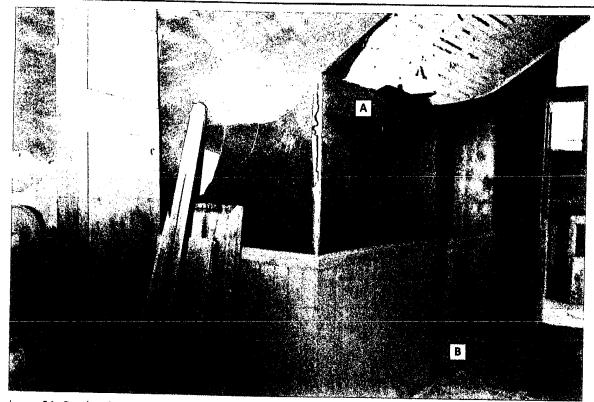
Boys' Bathroom view northeast. (A) Stair soffit of rear stairwell, (B) Disintegrating concrete.
